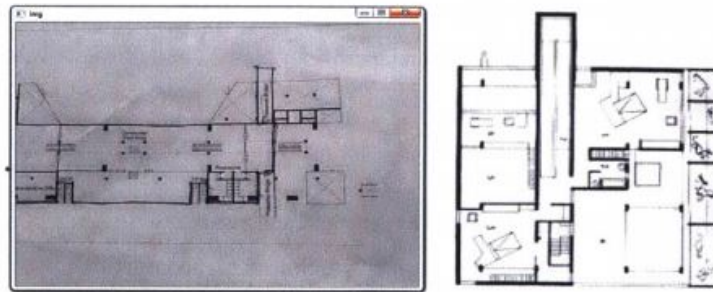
A participant's second attempt and CV tutor's suggested floor plan. A participant takes a picture of the right part of his floor plan and the CV tutor suggested Le Corbusier's Villa Shodhan floor plan.
